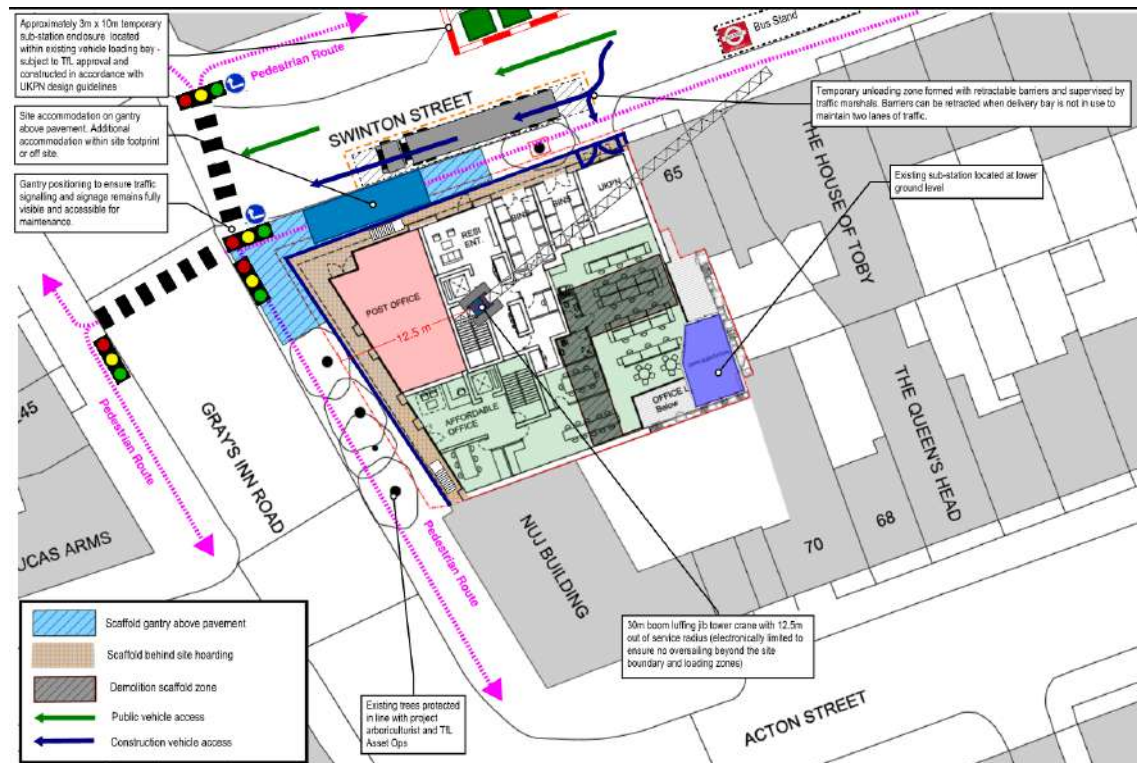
Extract of Logistics Plan indicating construction vehicle access/egress location on Swinton Street
